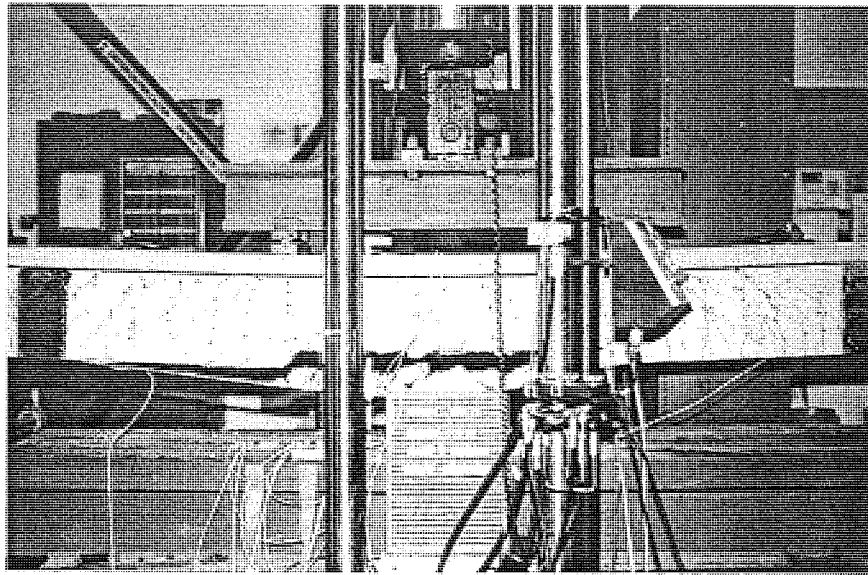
Condition of Beam No. 13 failed by delamination before re-testing.
